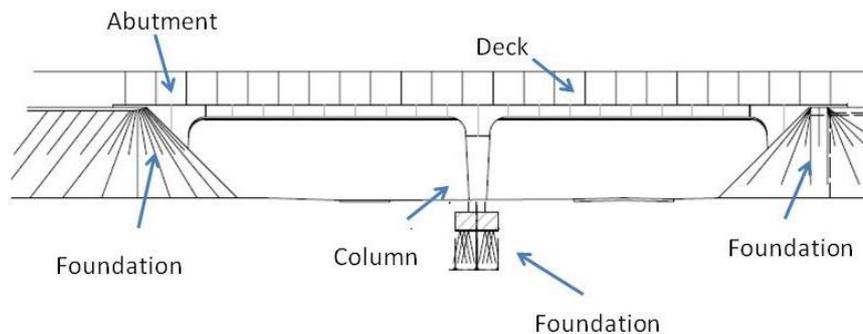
A typical viaduct, consisting of a deck, centre columns, abutments and foundation
